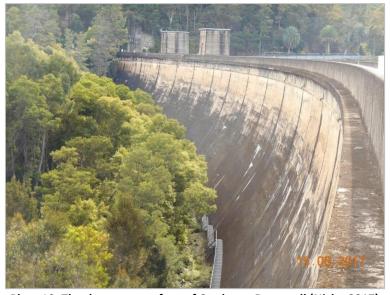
The downstream face of Cordeaux Dam wall (Niche 2017)
